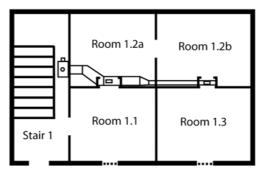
First floor plan view. The intake for the recirculating fan unit is in the stairwell. Outlets are in Rooms 1.2a, 1.2b, and two rooms on the second floor.
